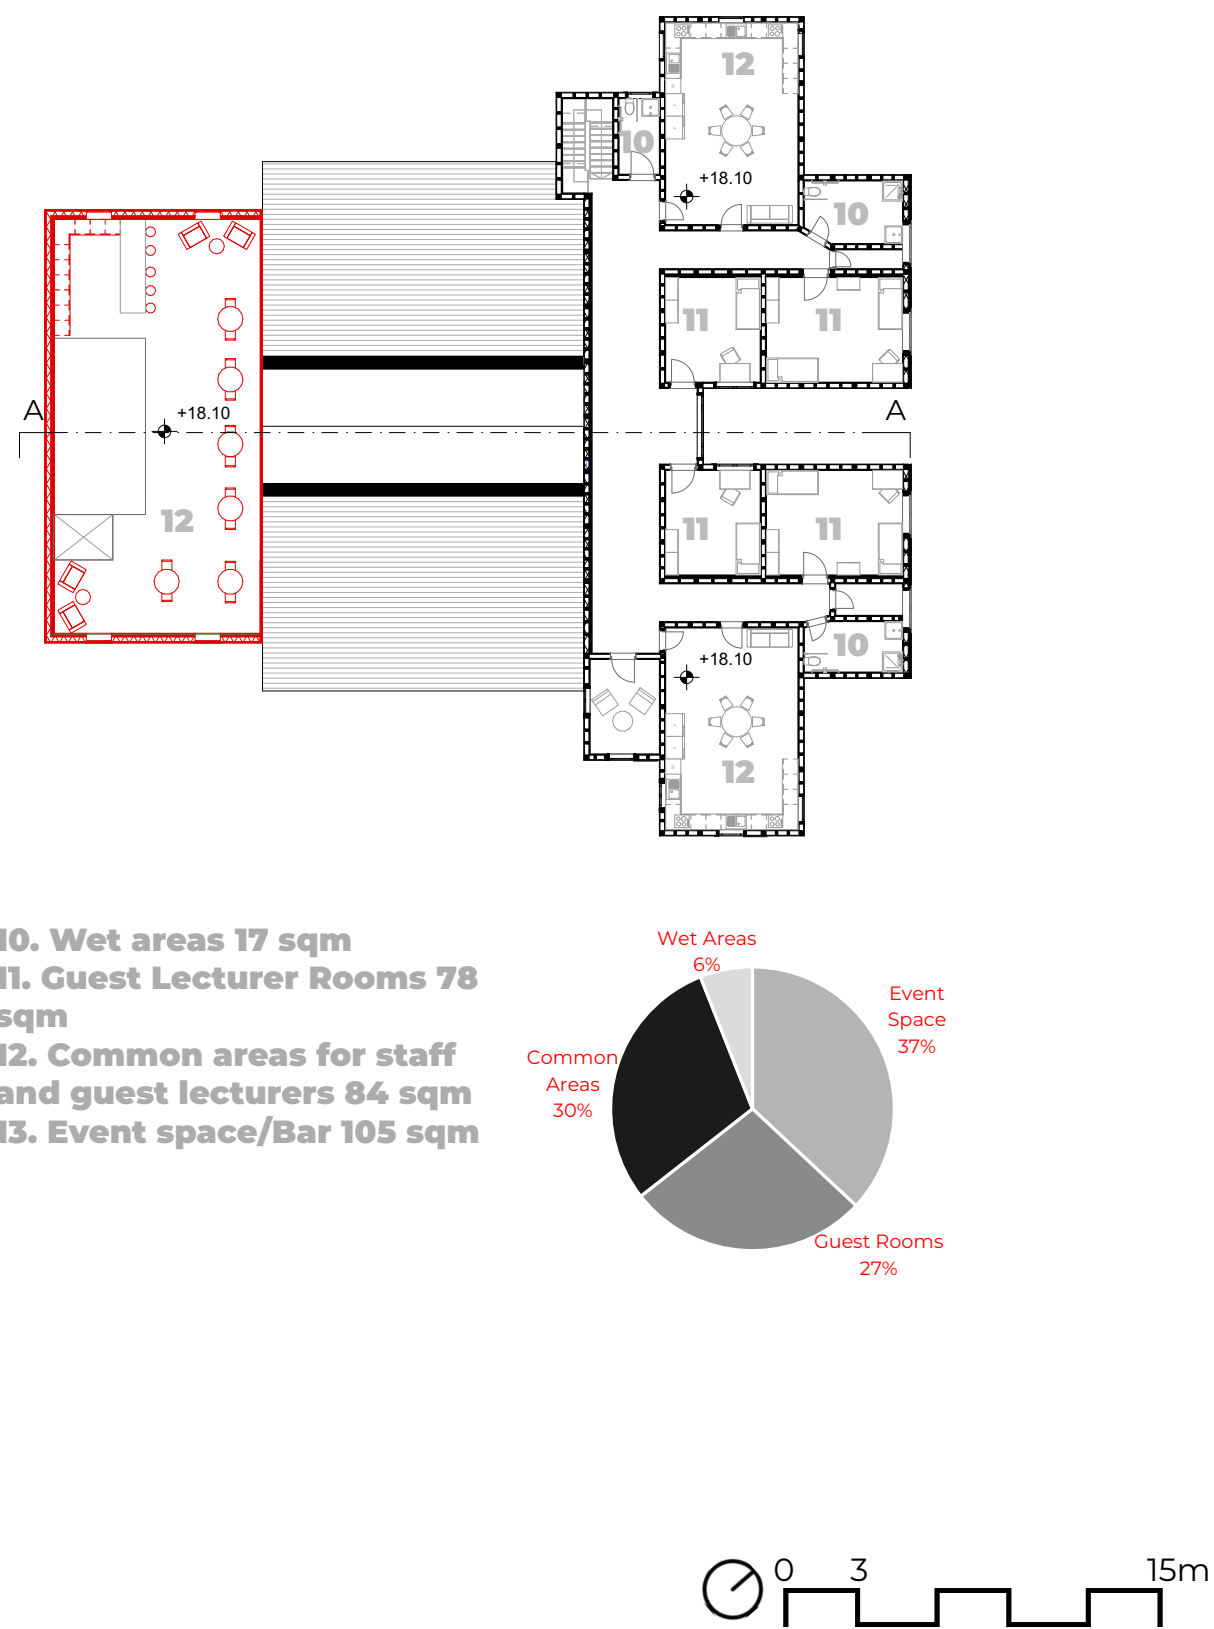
Fifth Floor Plan (Source: Created by the author, 2025)
